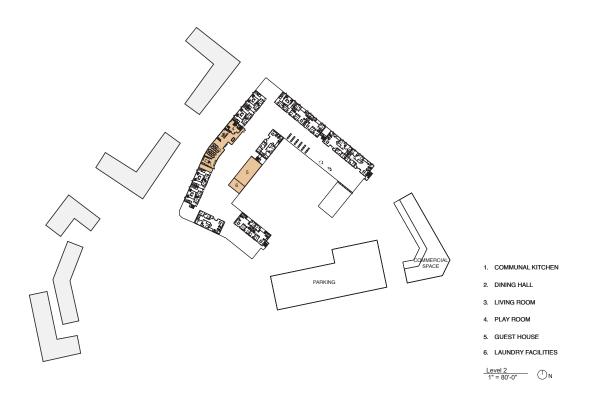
2nd level floor plan highlighting the five main spaces in the common house. Source: Author
